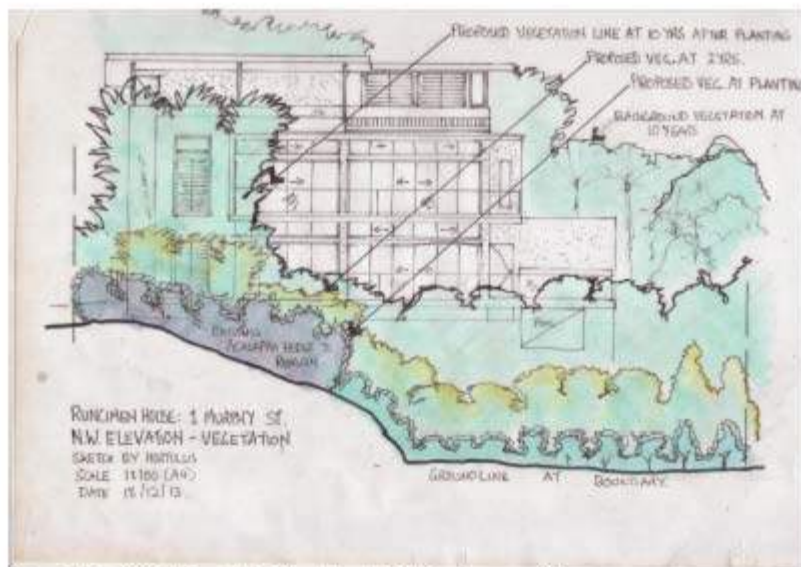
North West Vegetation Elevation at planting, 2 years and 10 years.
